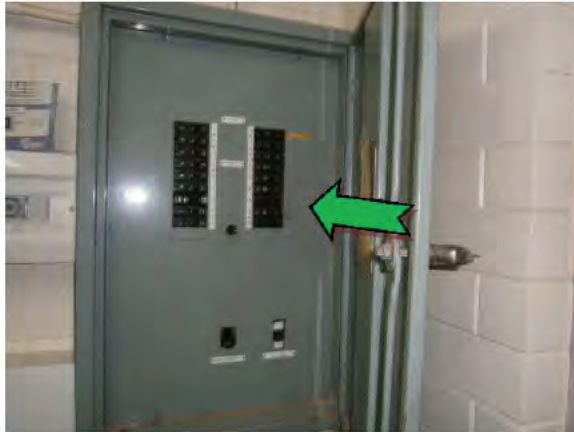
Ground level, printer room, electrical backing board – suspected non asbestos-containing bituminous backing board
